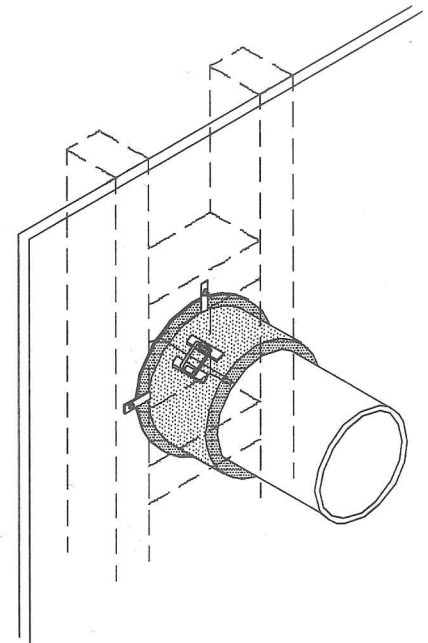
Intumescent pipe collar fitted around a PVC pipe and to the surface of the wall
